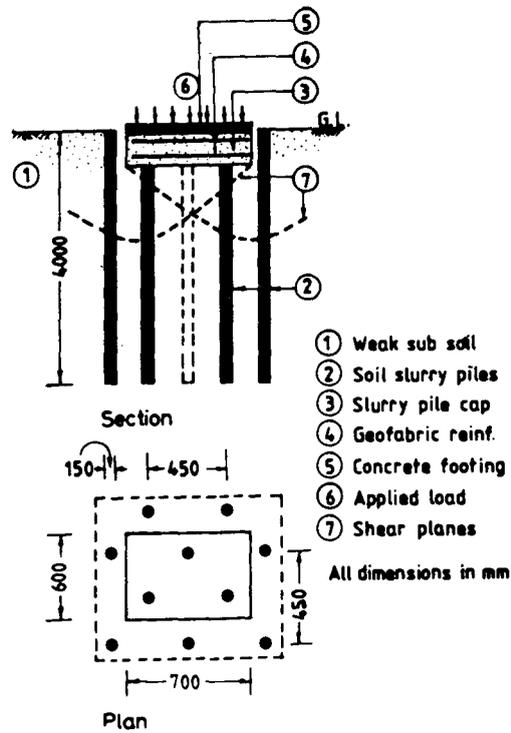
Influence of reinforcing the weak soil immediately below & around the footing by soil slurry piles
